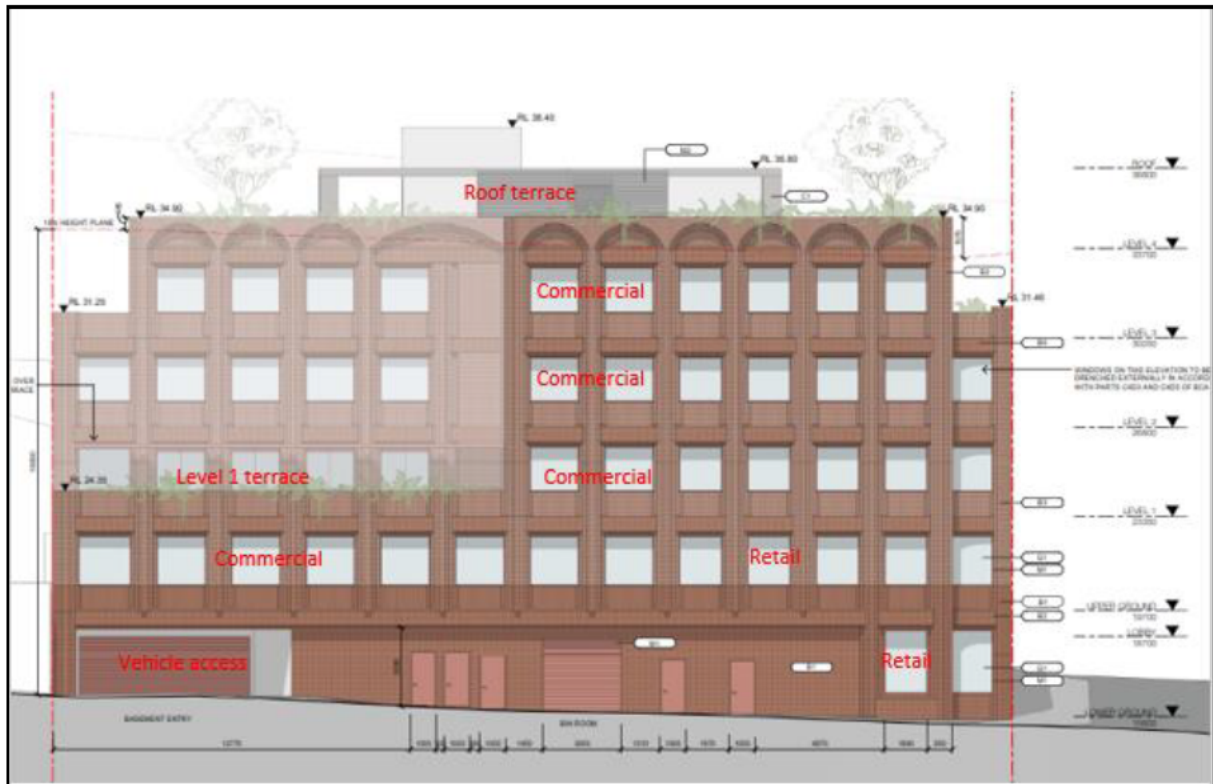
Extract from West Elevation showing proposed uses in proximity to SP 57988
